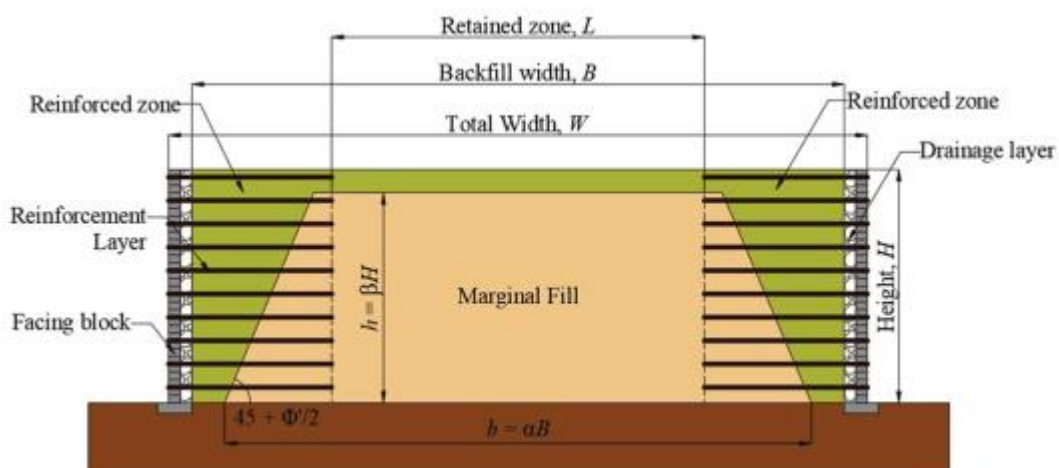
Proposed hybrid back-to-back wall (Rajagopal and Thiyyakkandi 2021).
